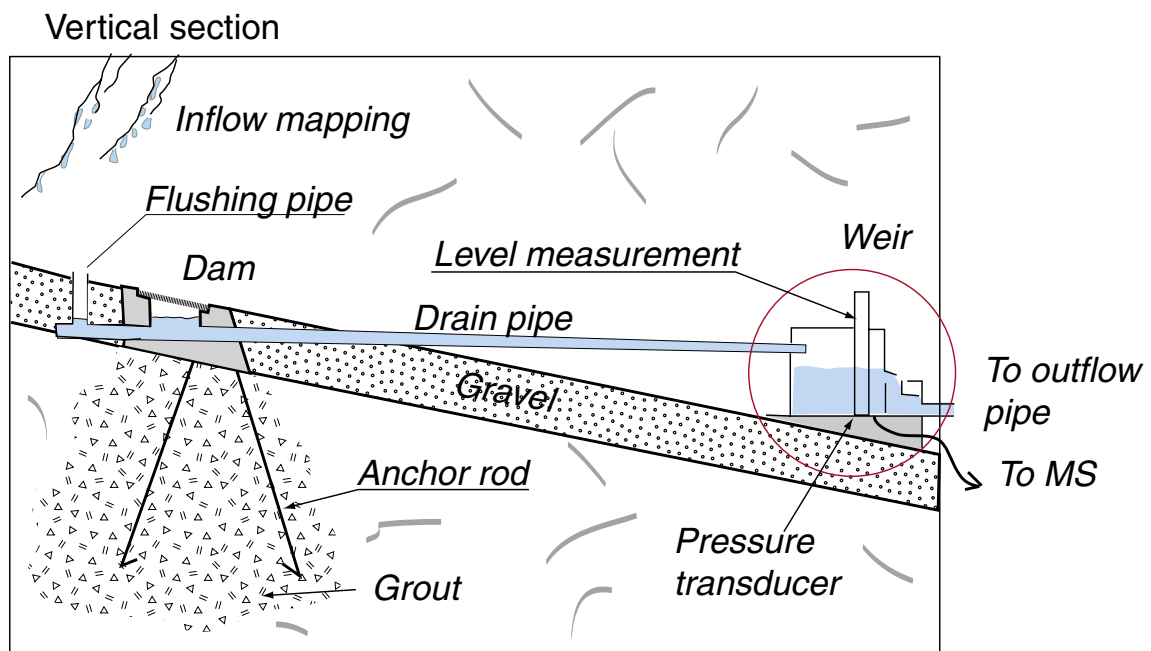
Construction of water dams for collecting water inflow along tunnel intervals.
